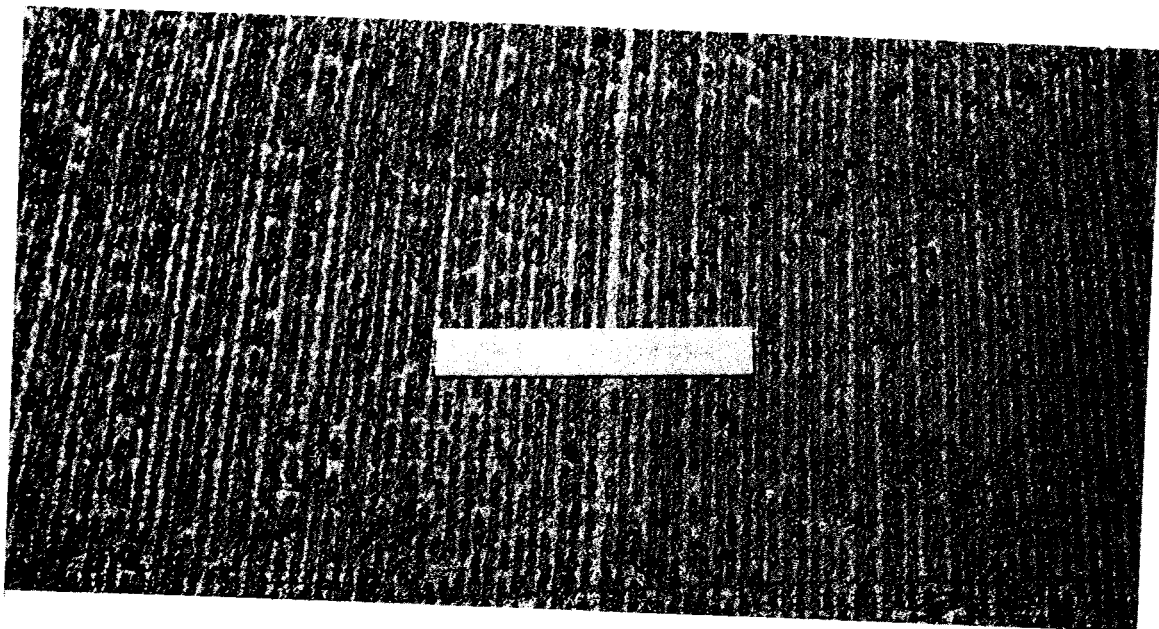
Test Section F-18: 1/8 in. Transverse Tine Finish (As Constructed)
